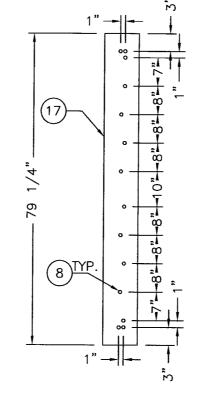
DETAIL C STRIKE PLATES TO JAMBS SCALE: 3/8" =1'-0"
